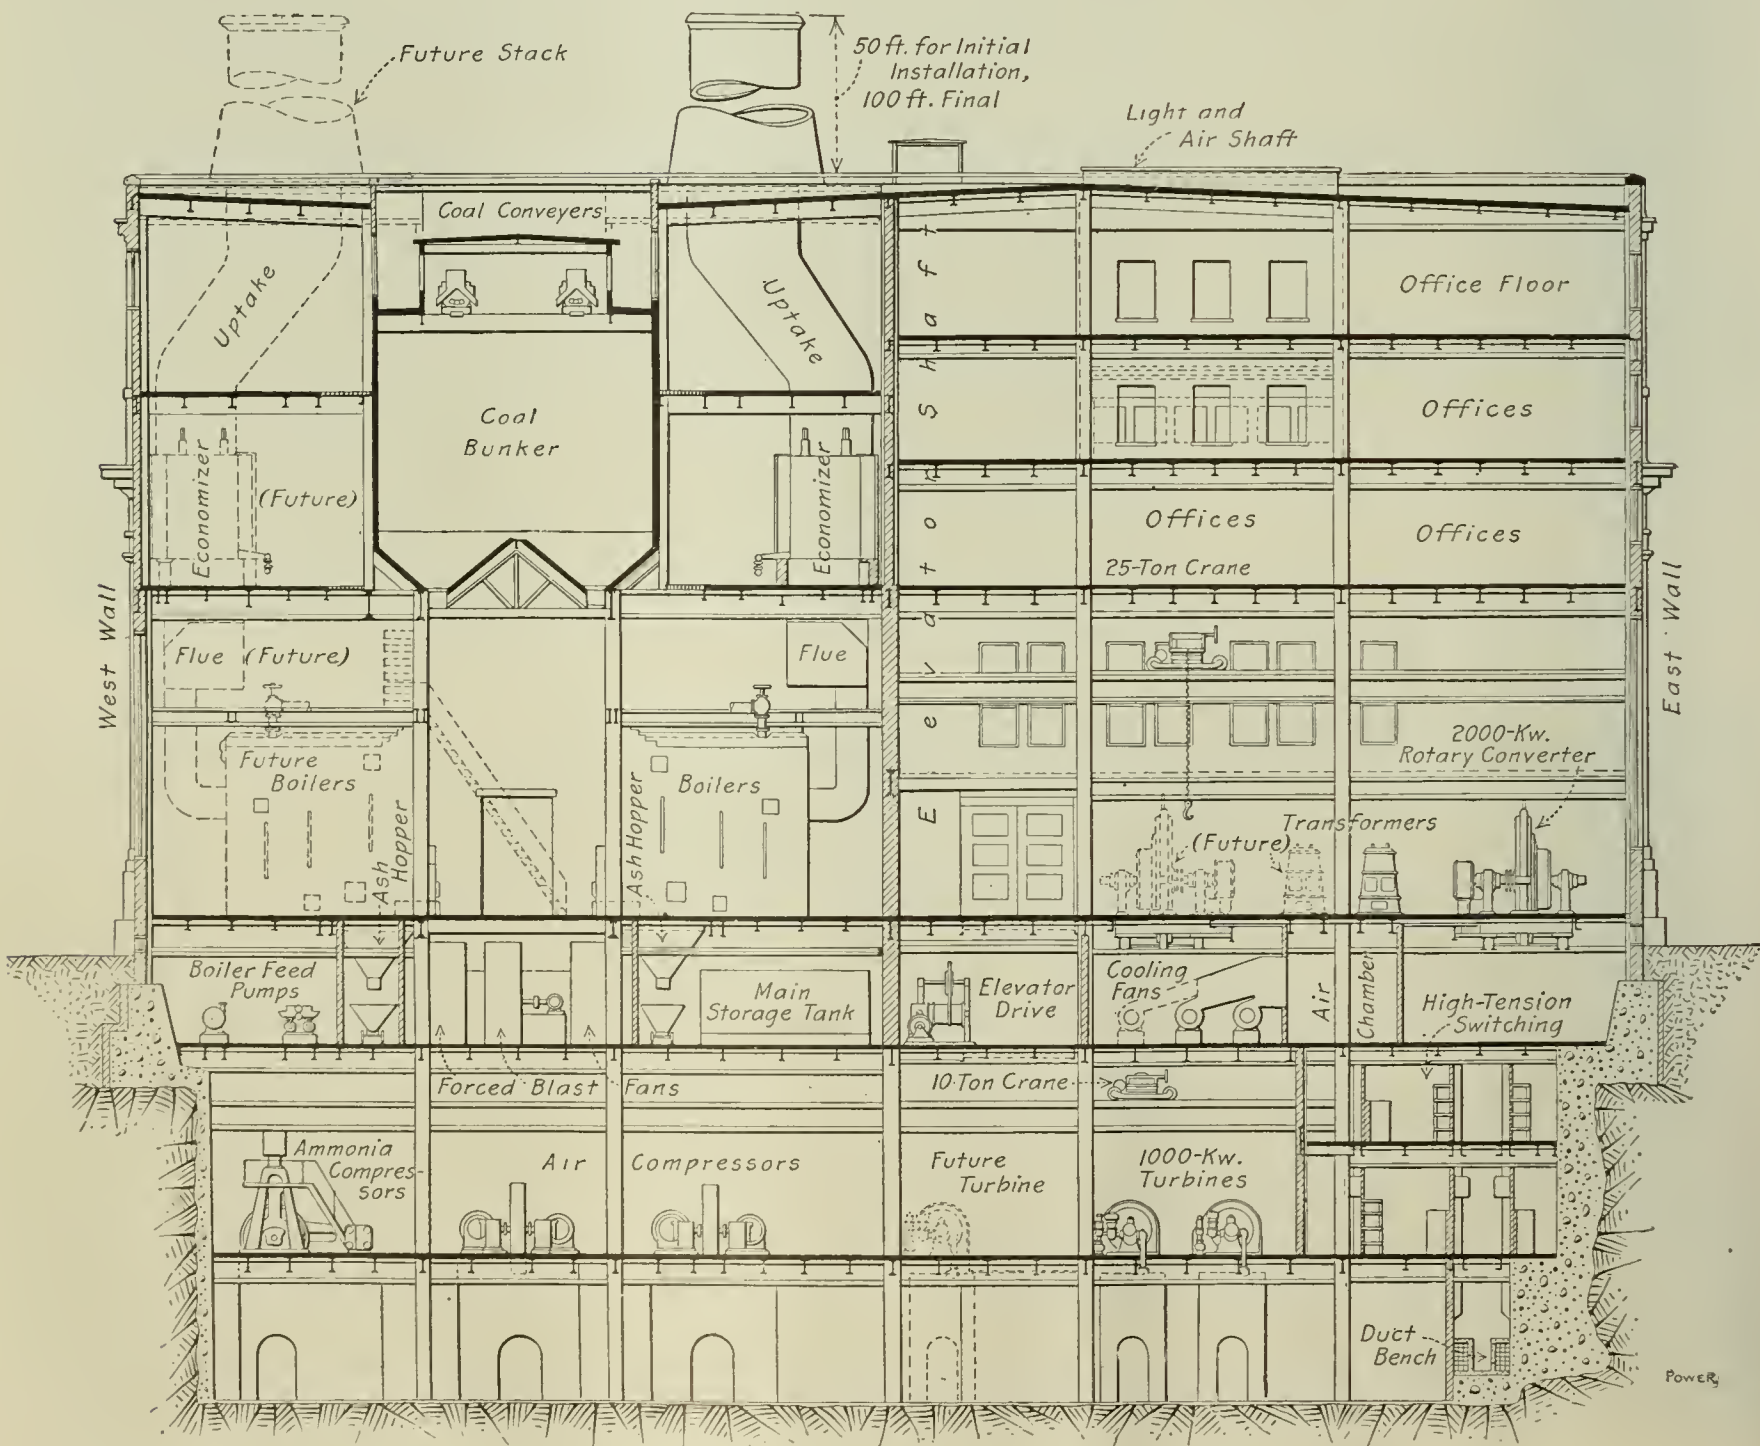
SECTIONAL ELEVATION LOOKING TOWARD FRONT OF SERVICE PLANT
